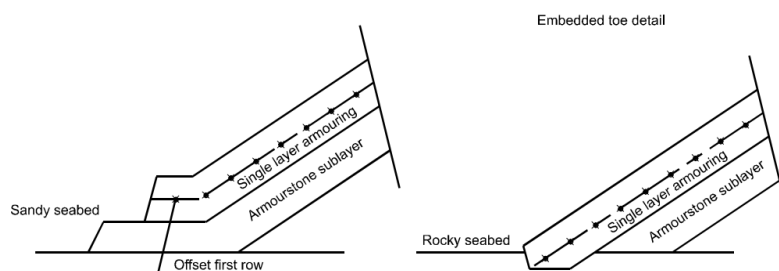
Toe details for single-layer concrete armour units (CIRIA et al., 2007/2012).
